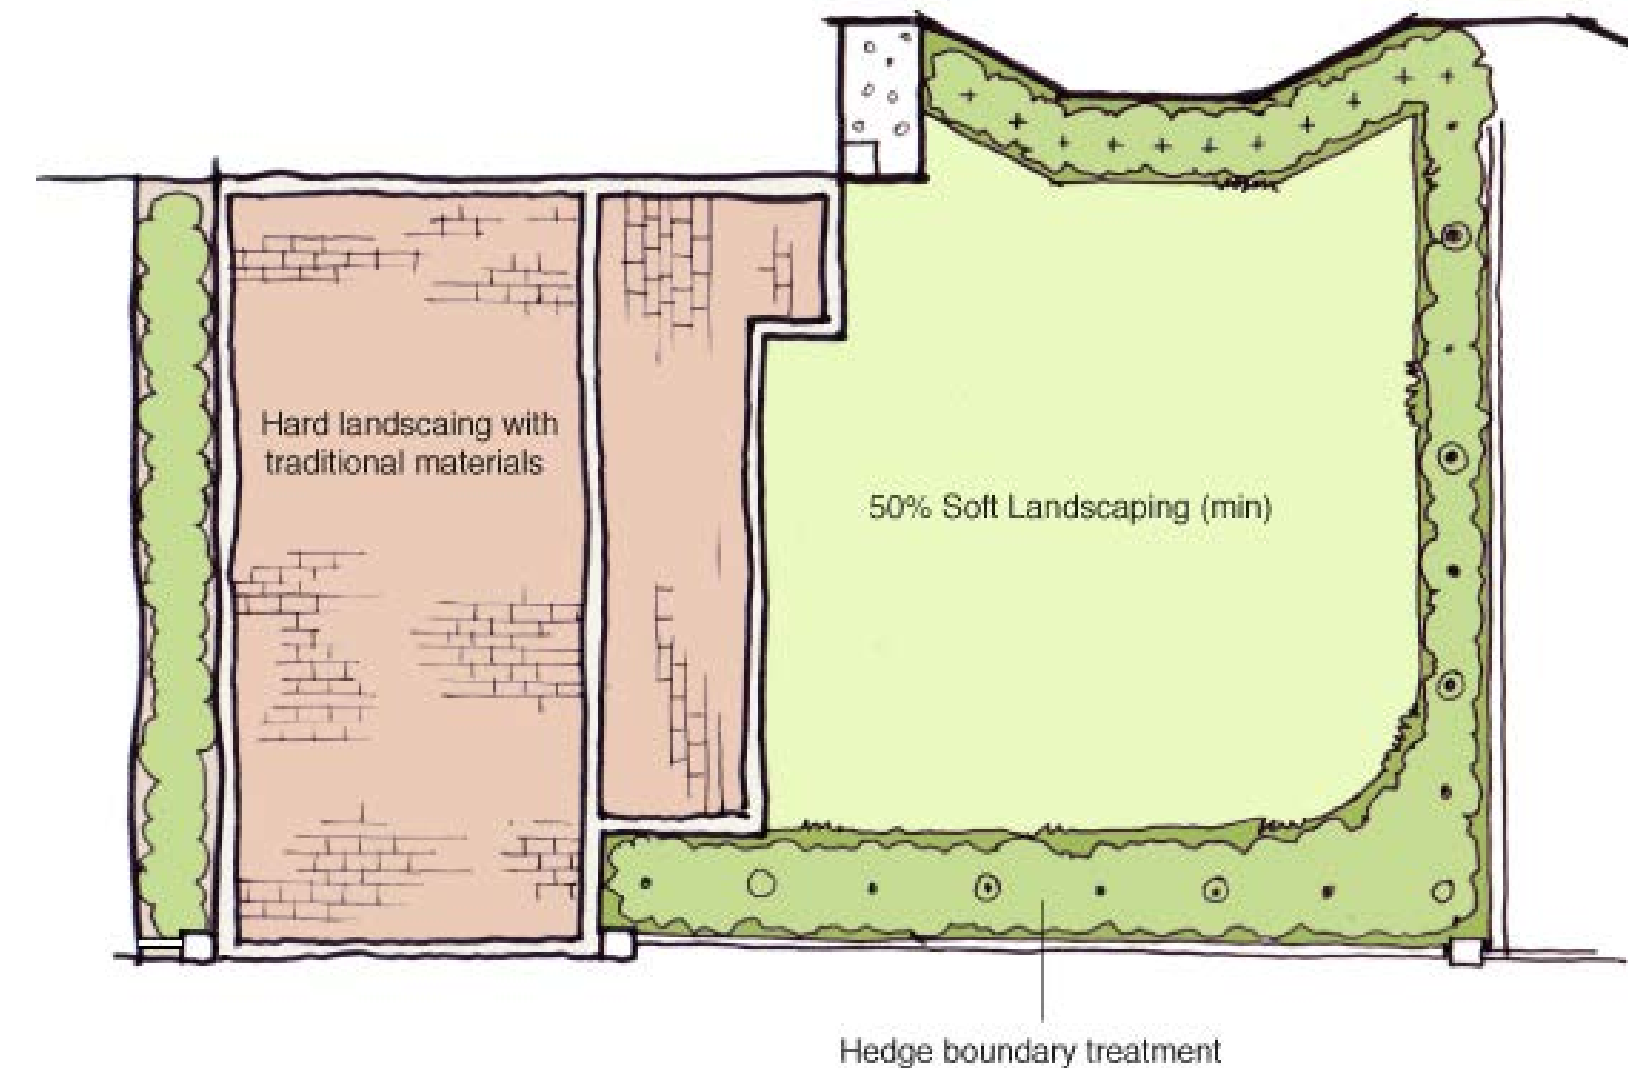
Illustration of a hedgerow plan at Sudbury Court
